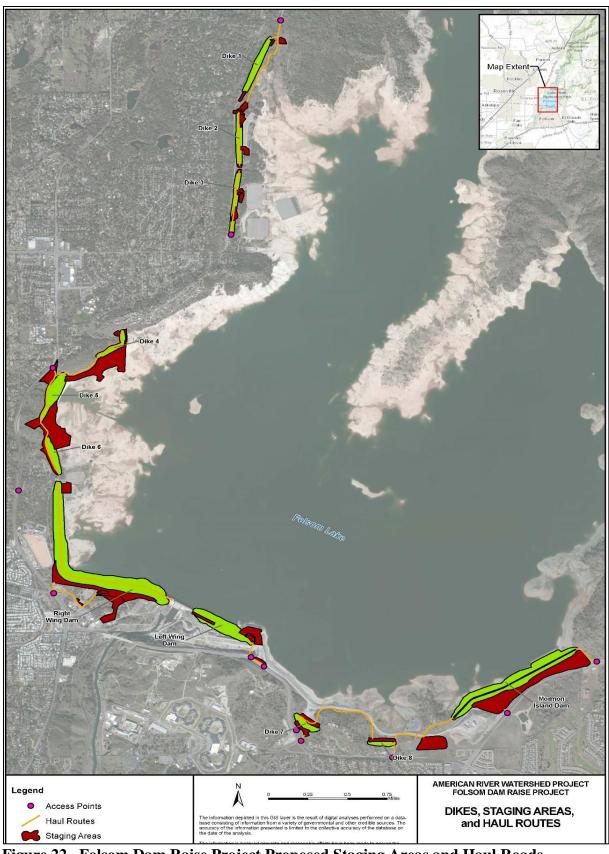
Folsom Dam Raise Project Proposed Staging Areas and Haul Roads.
